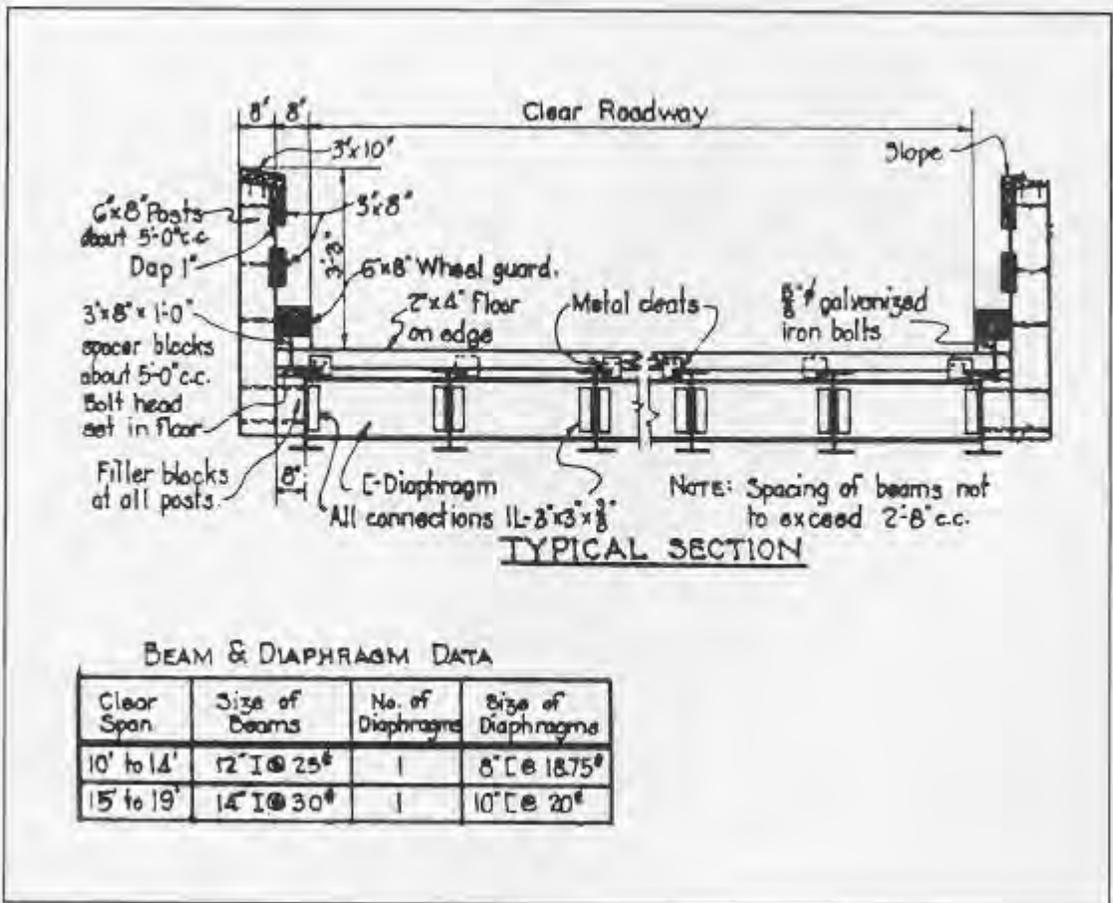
Standard Steel Beam Bridges for Secondary Roads from 1933 Standard Plans (Source Maryland State Roads Commission 1933).
